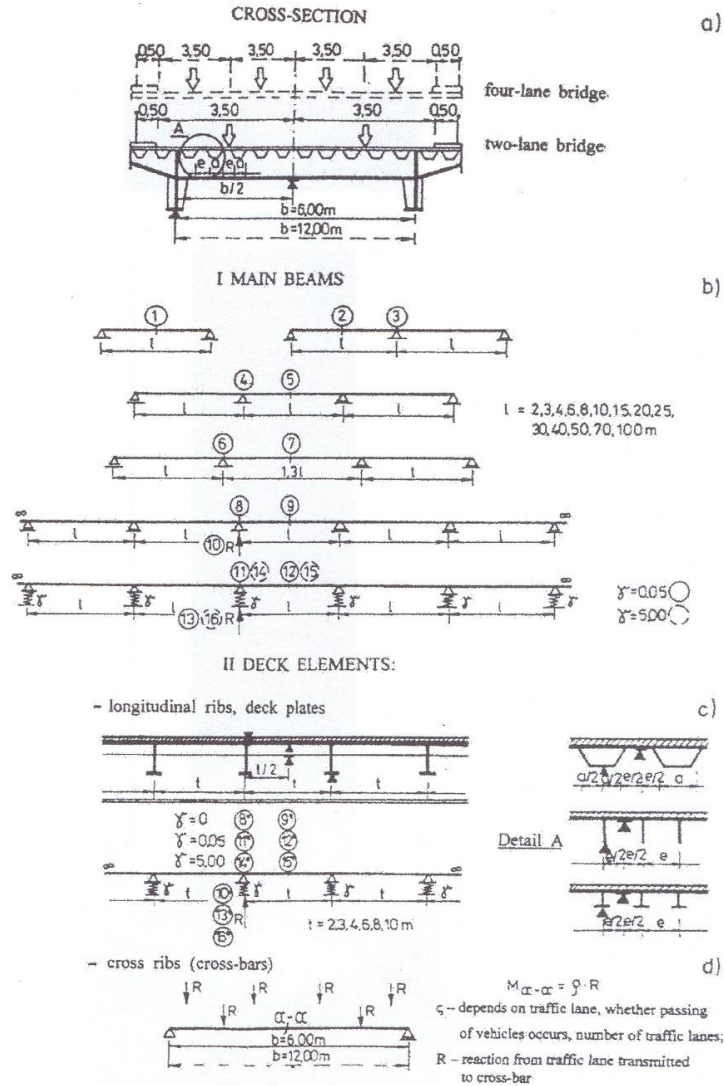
Structural bridge elements cross-sections and static schemes assumed for calculations
